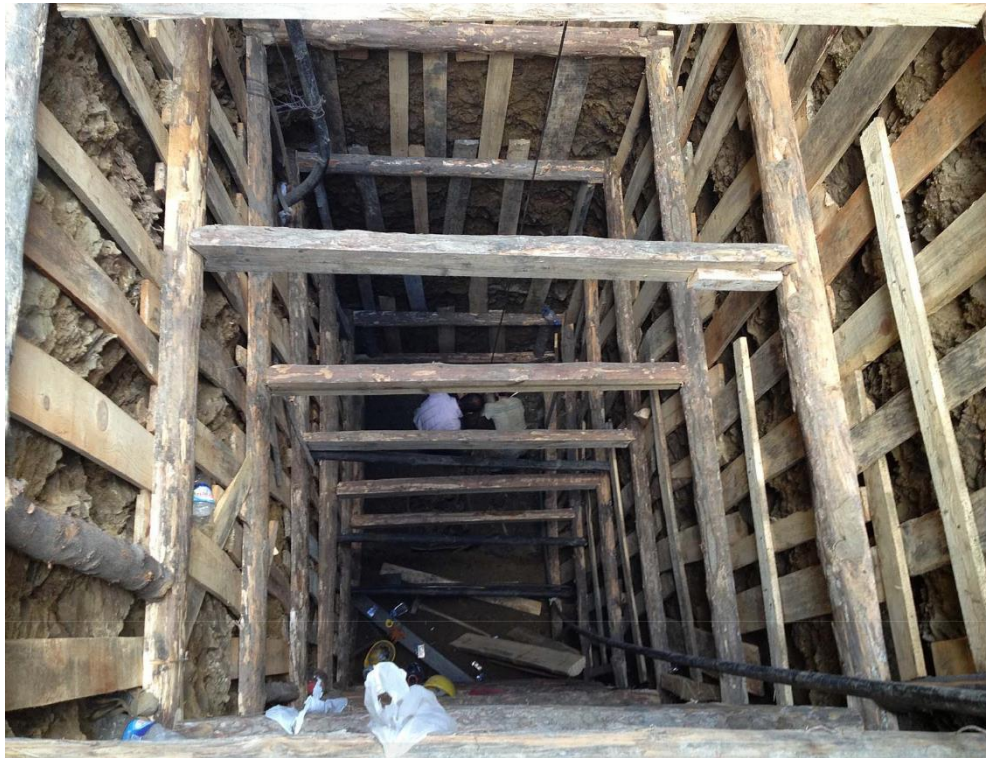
Ongoing excavation and preserving soil anchors from first lot
